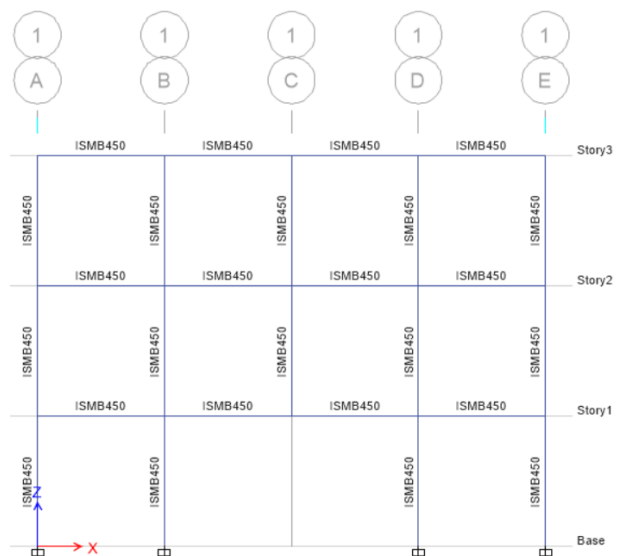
Elevation View of a Three Storied Square Building without Bracing
